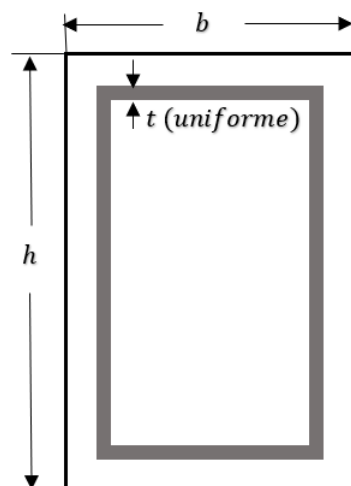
Rectangular idealized cross section of reinforced concrete
